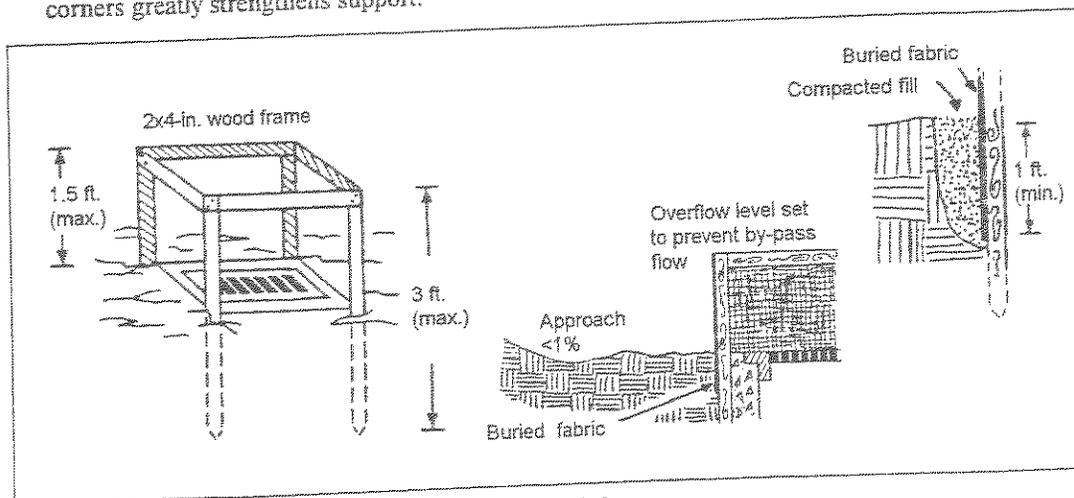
B. Supporting frame and installation of the fabric.
